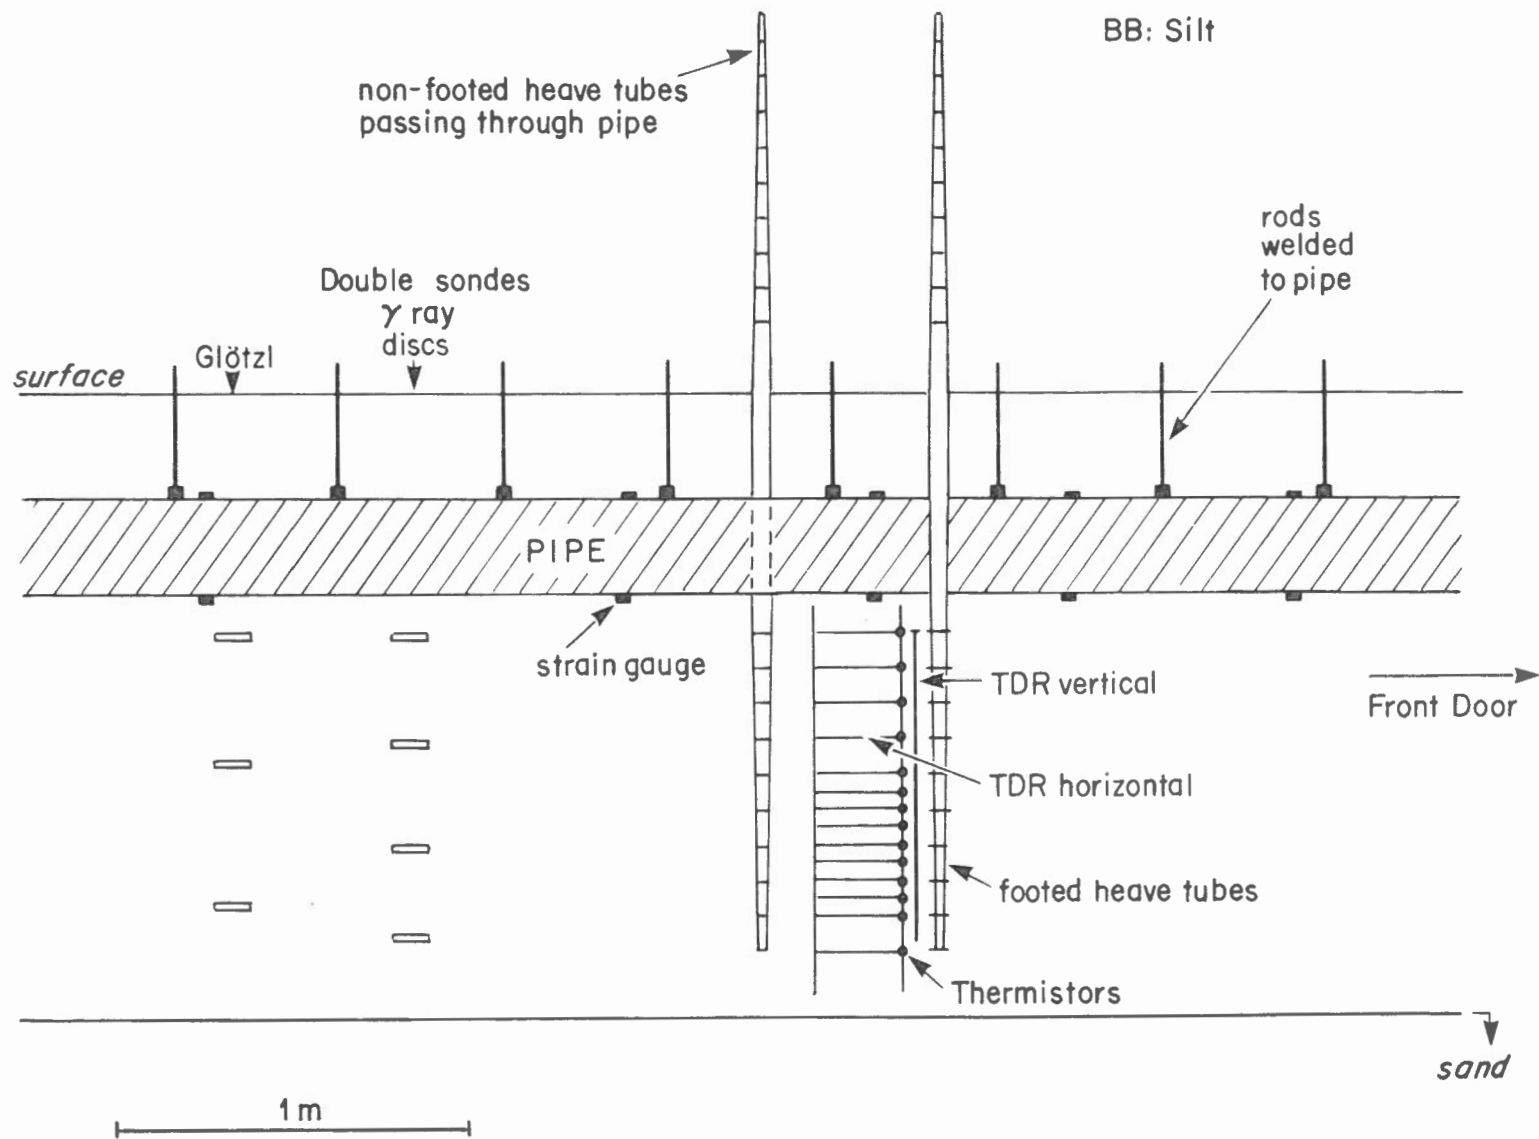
Longitudinal section detailing pipe deformation instrumentation, TDR probes and telescoping heave tubes.
